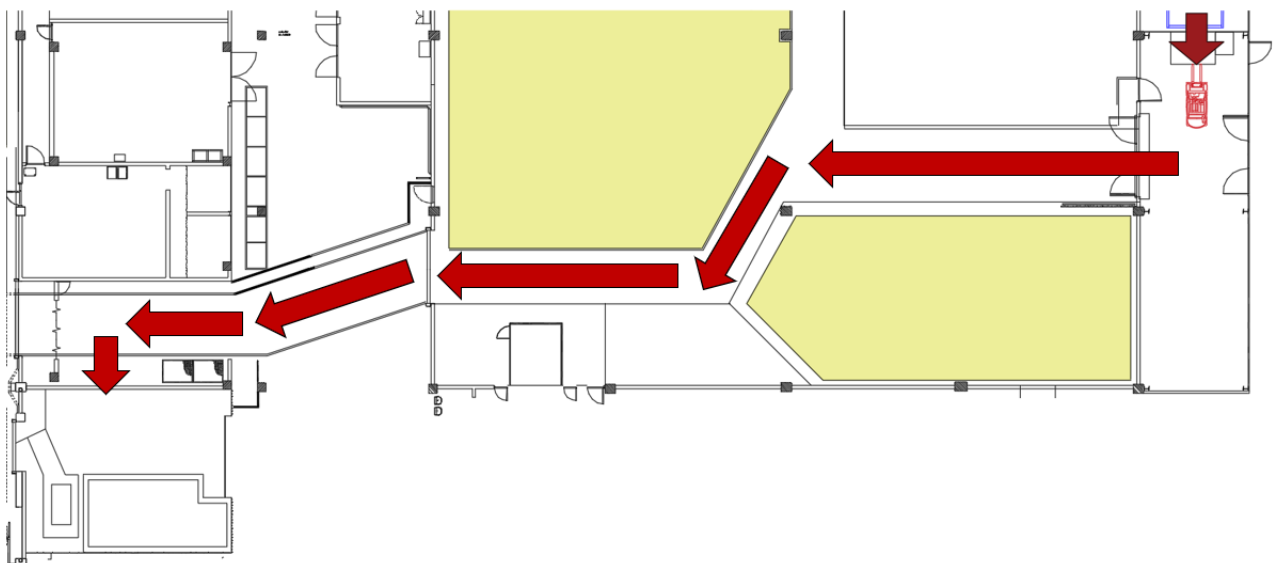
Total travelled distance from dock to warehouse in the old layout: 75 metres
